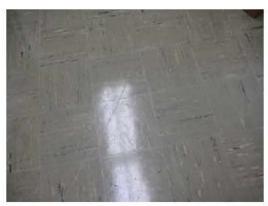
9 inch x 9 inch light-green floor tile with tan and dark green flecks was observed in Room 1 (Superintendent's Office).
